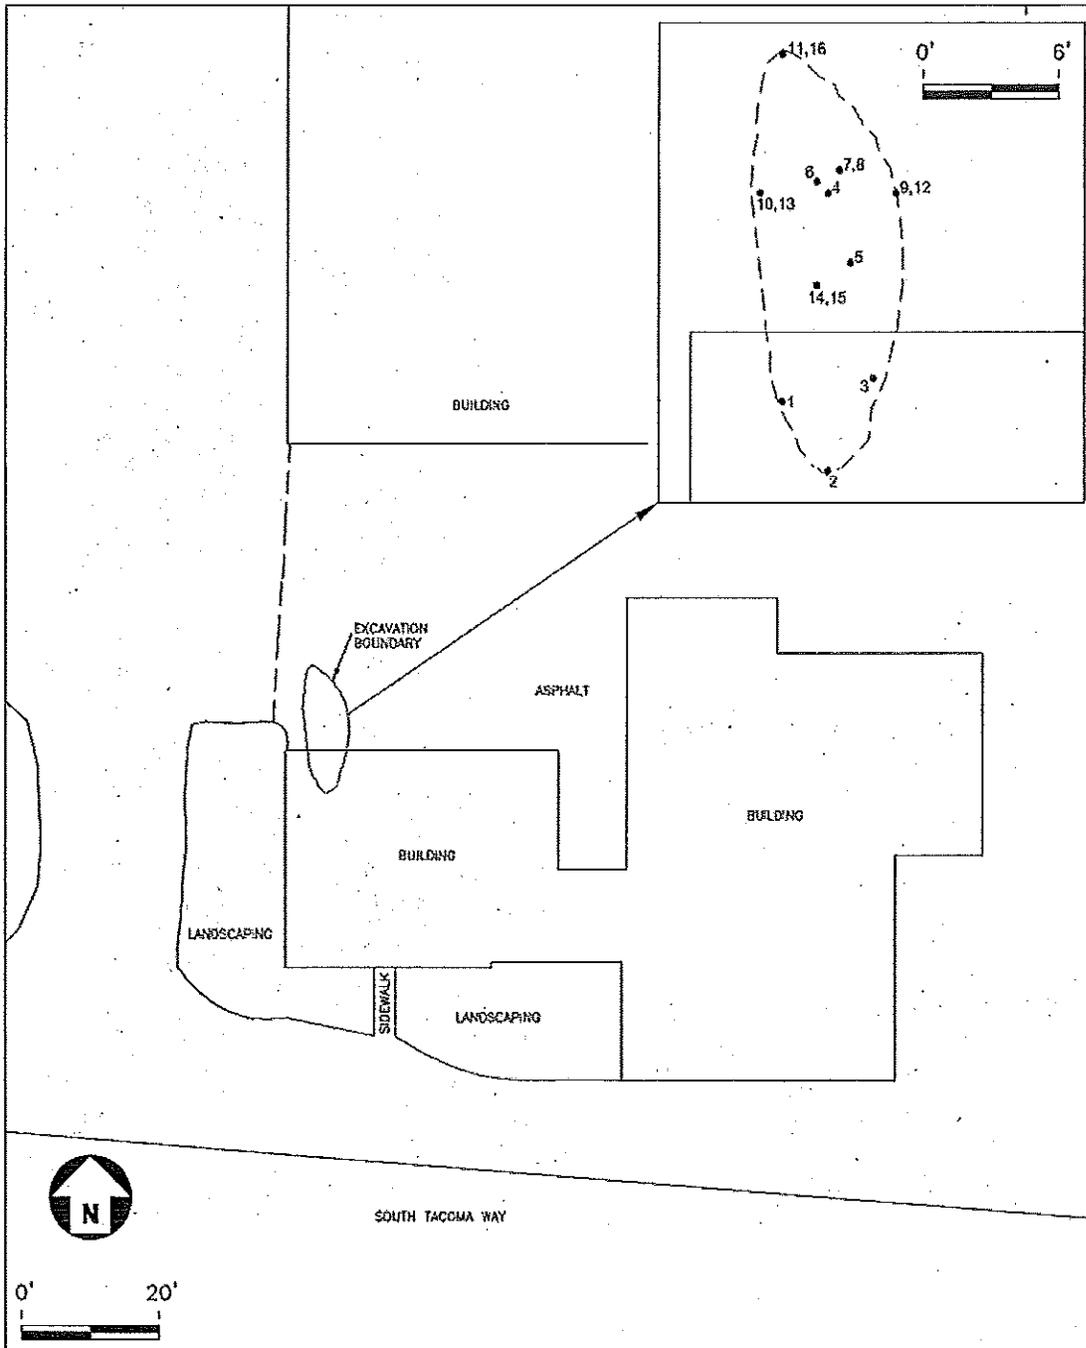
Soil Excavation conducted on October 30, 2012. The excavation stopped at 13 feet bgs on average because of concerns of building foundation stability. The excavation did not reach the bottom of soil contamination. Conformation soil samples indicate soil contamination remains.
